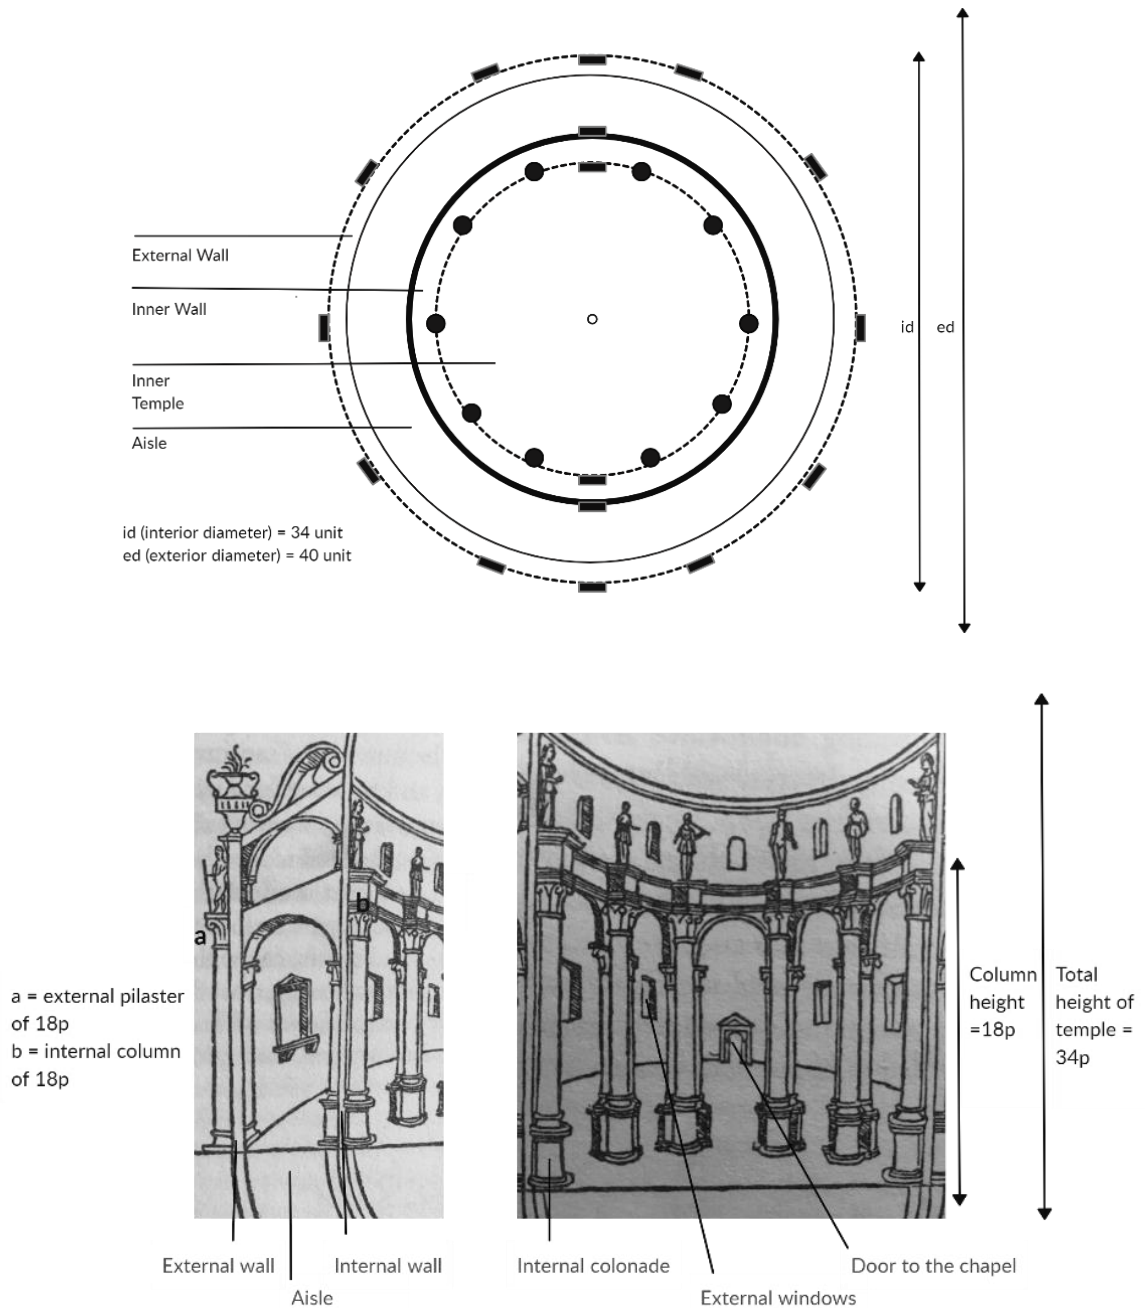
Plan of the interior and exterior position of columns and pilasters
